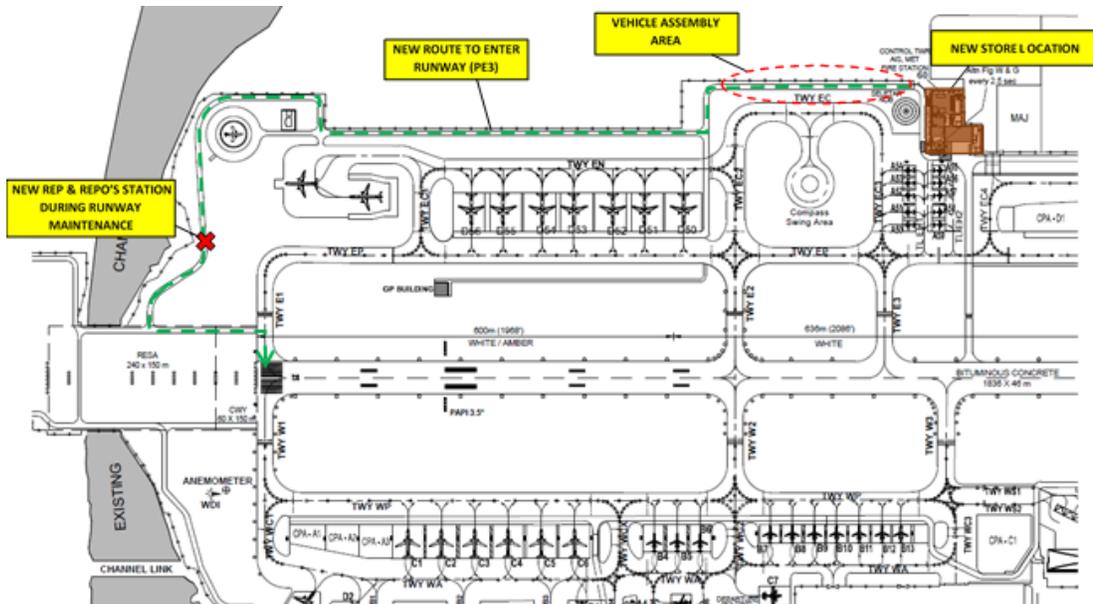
New route for entering and exiting the runway (indicated in green) and the new location of the store
